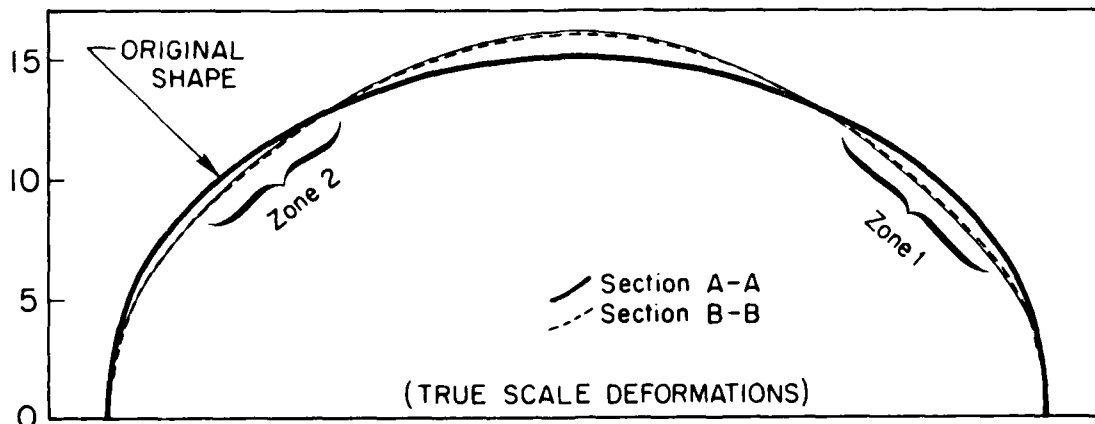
Final Deformations of the Vista Culvert at Measurement Sections A-A and B-B
